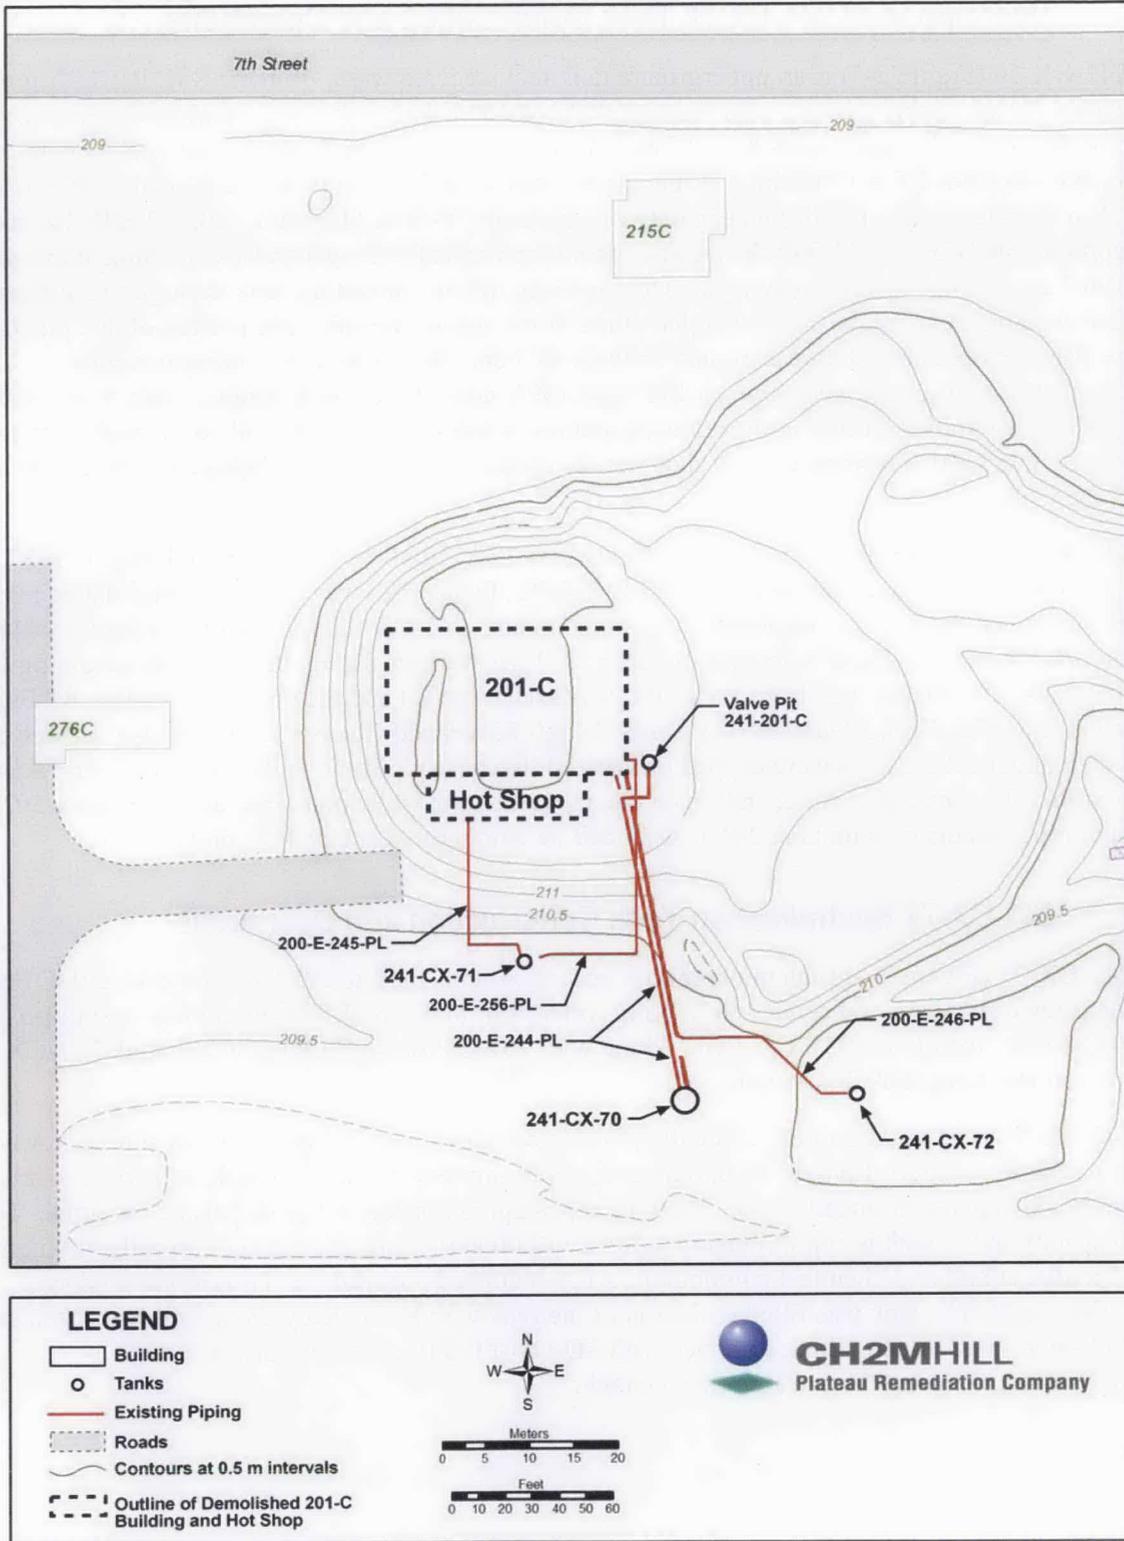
241-CX Tanks and Piping Layout and Current Configuration
